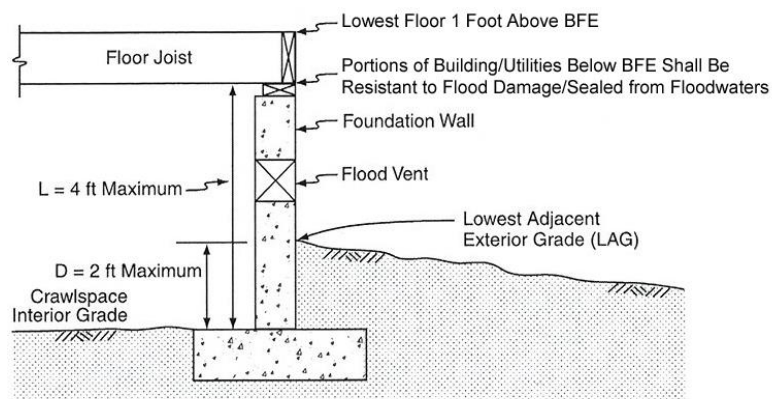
Requirements for Below-Grade Crawlspace Construction
